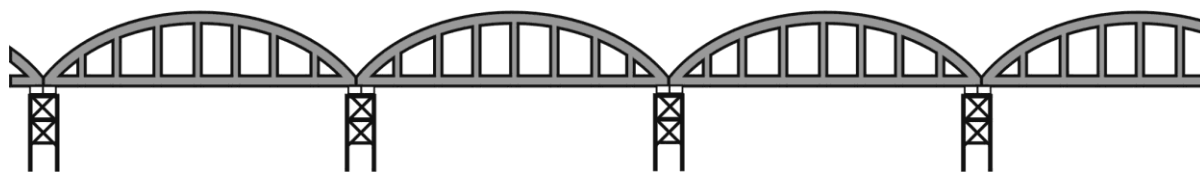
Reinforced concrete bridge project across Chirchik river (1912 ).
